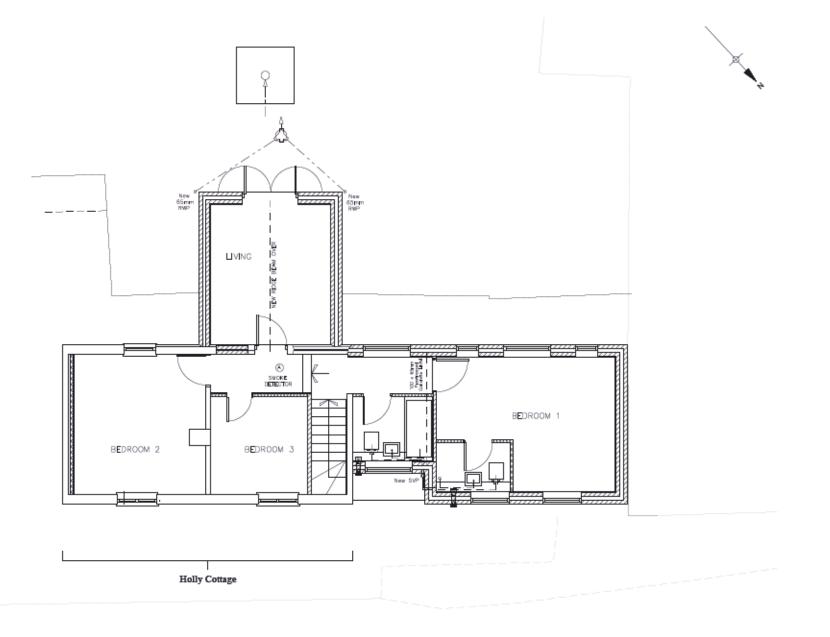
Phased Existing Ground Floor Plan showing Plate Directions 1:100 at A3
